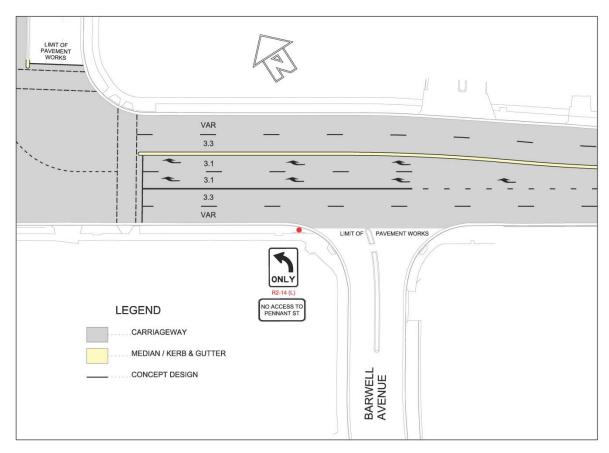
Barwell Avenue intersection and right turn arrangement to Pennant Street
